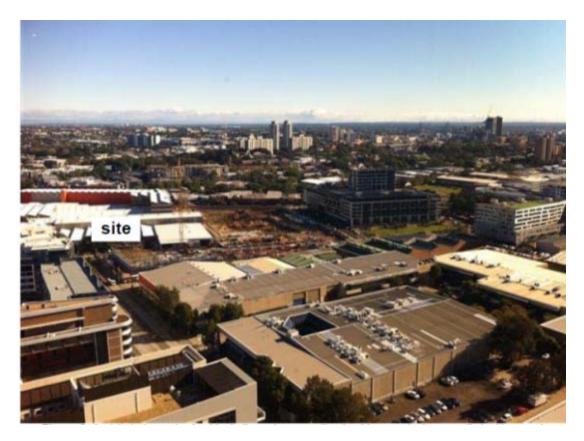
Aerial photograph of the subject site and surrounding Lachlan precinct, generally looking west
